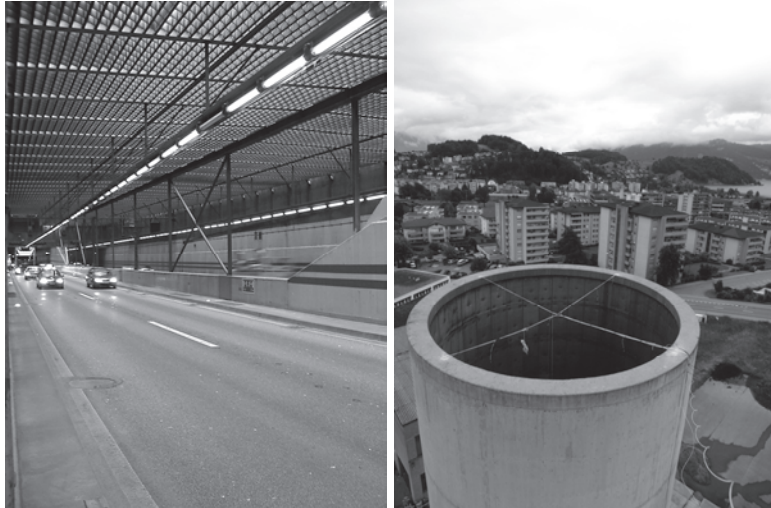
Multi-point tracer sampling on road level of the tunnel Schöneich in Zurich (left) and on exhaust chimney of the tunnel Spier near Lucerne.
